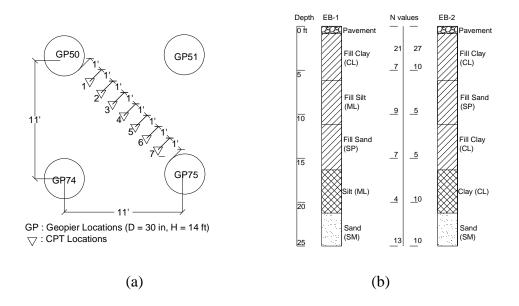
Salinas, CA: The plan layout of CPT locations (a) within a pier group and (b) subsoil profiles from SPT
